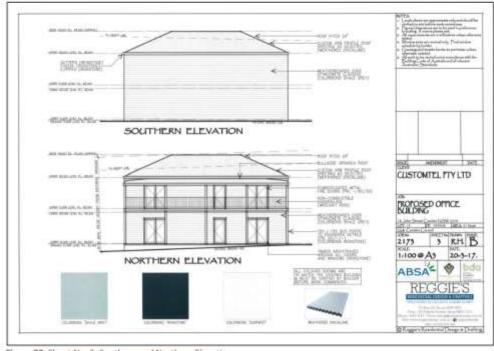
Sheet No. 3, Southern and Northern Elevation.
